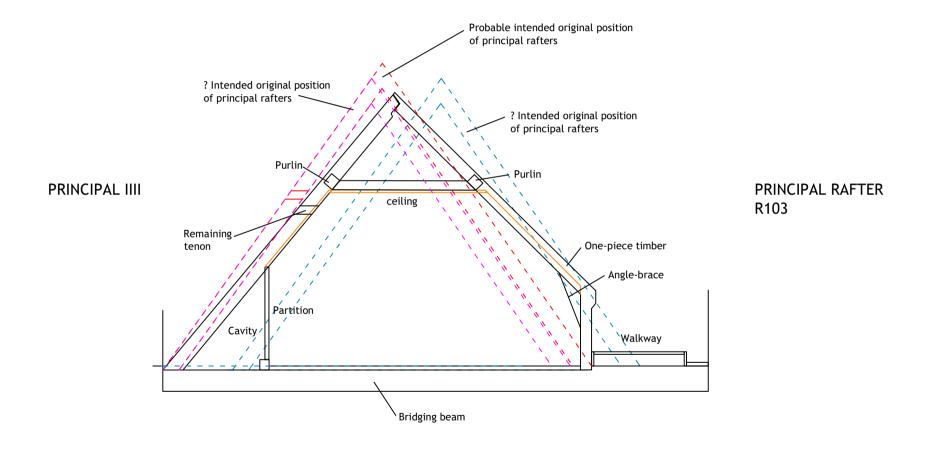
Apethorpe Hall, Northamptonshire Position of Truss IIII in relation to possible intended positions of original roof-truss 1:50 at A4 RS/DW 26/09/07
